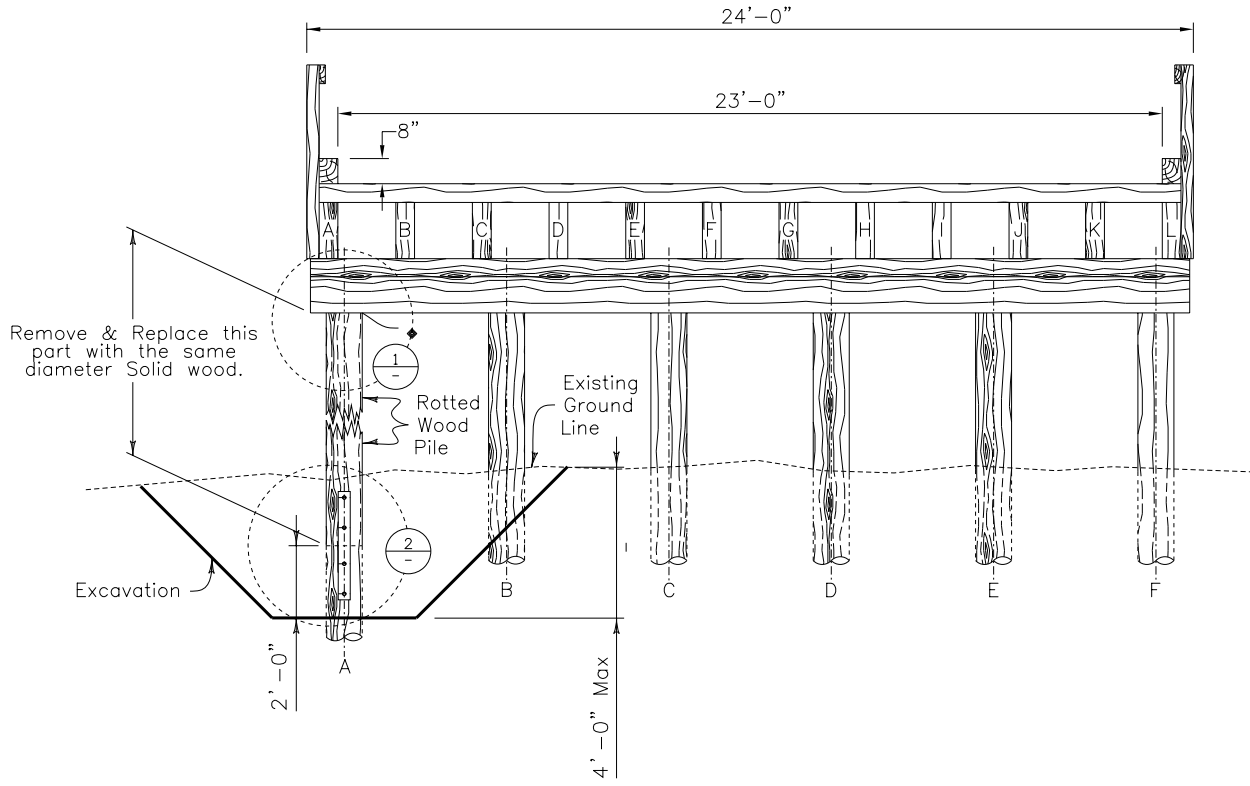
(G)-7 Sample Section of Replacing Portion of Timber Pile
